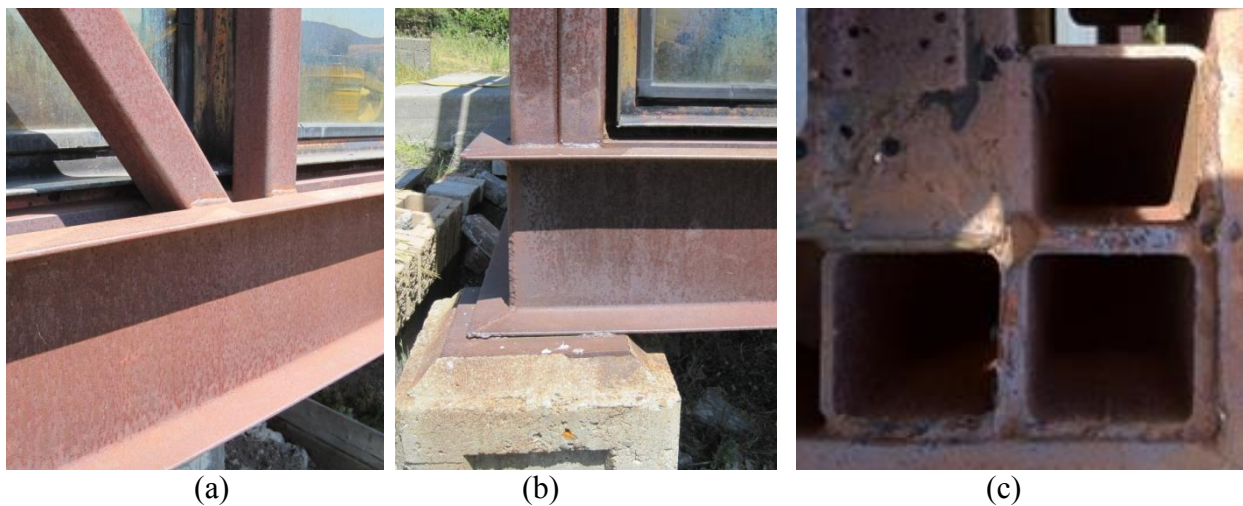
(a) Member Connections; (b) Boundary Conditions; (c) Plan View of Built-up Columns
